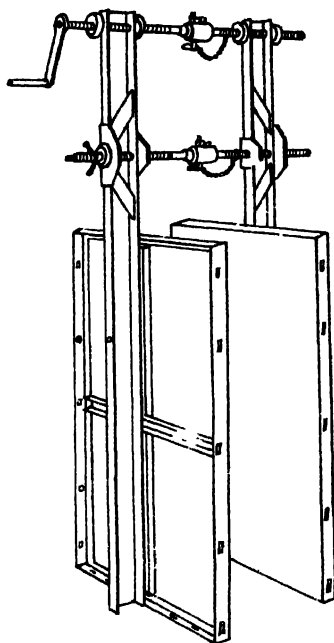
ACROW ADJUSTABLE STEEL WALL SHUTTLING CLAMPS
